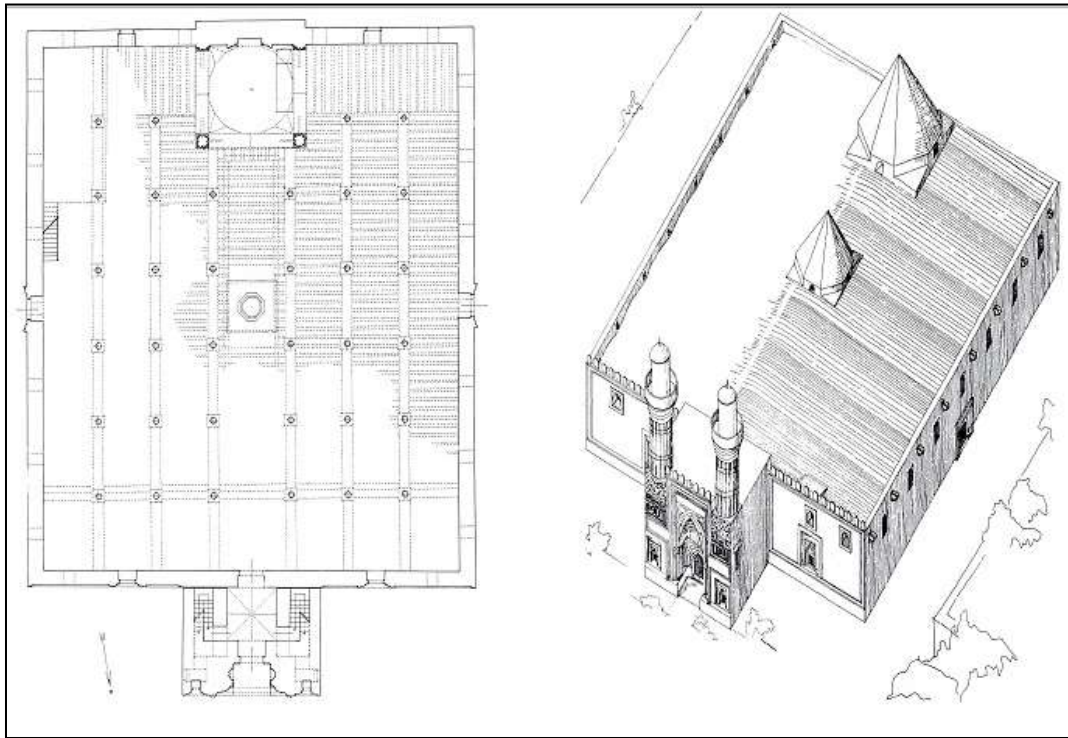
Plan and Perspective of Konya Sahip Ata Mosque (The waterspouts observed in the façade layouts before the fire) (URL 1)
